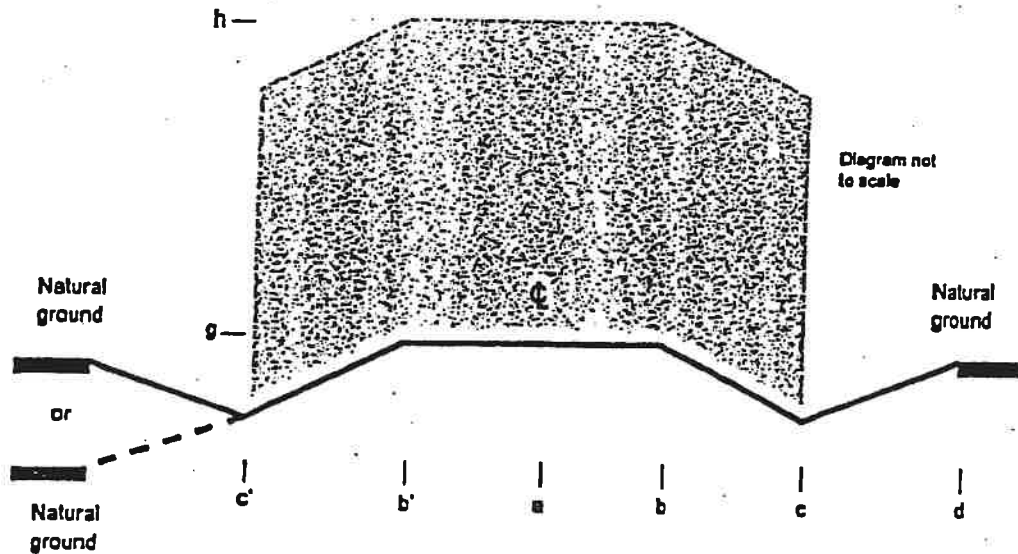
View of profile of public road and driveway showing placement of culvert and slope within town right-of-way.
